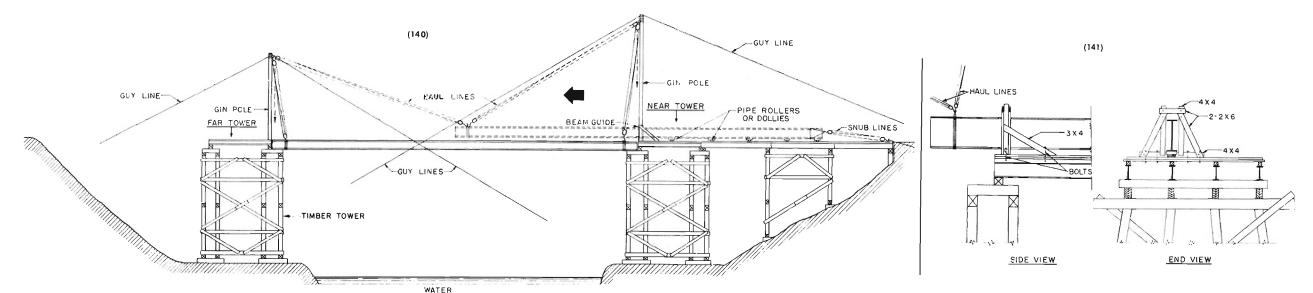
Launching steel stringers with gin poles. Gin poles on timber towers must be guyed to ground.
